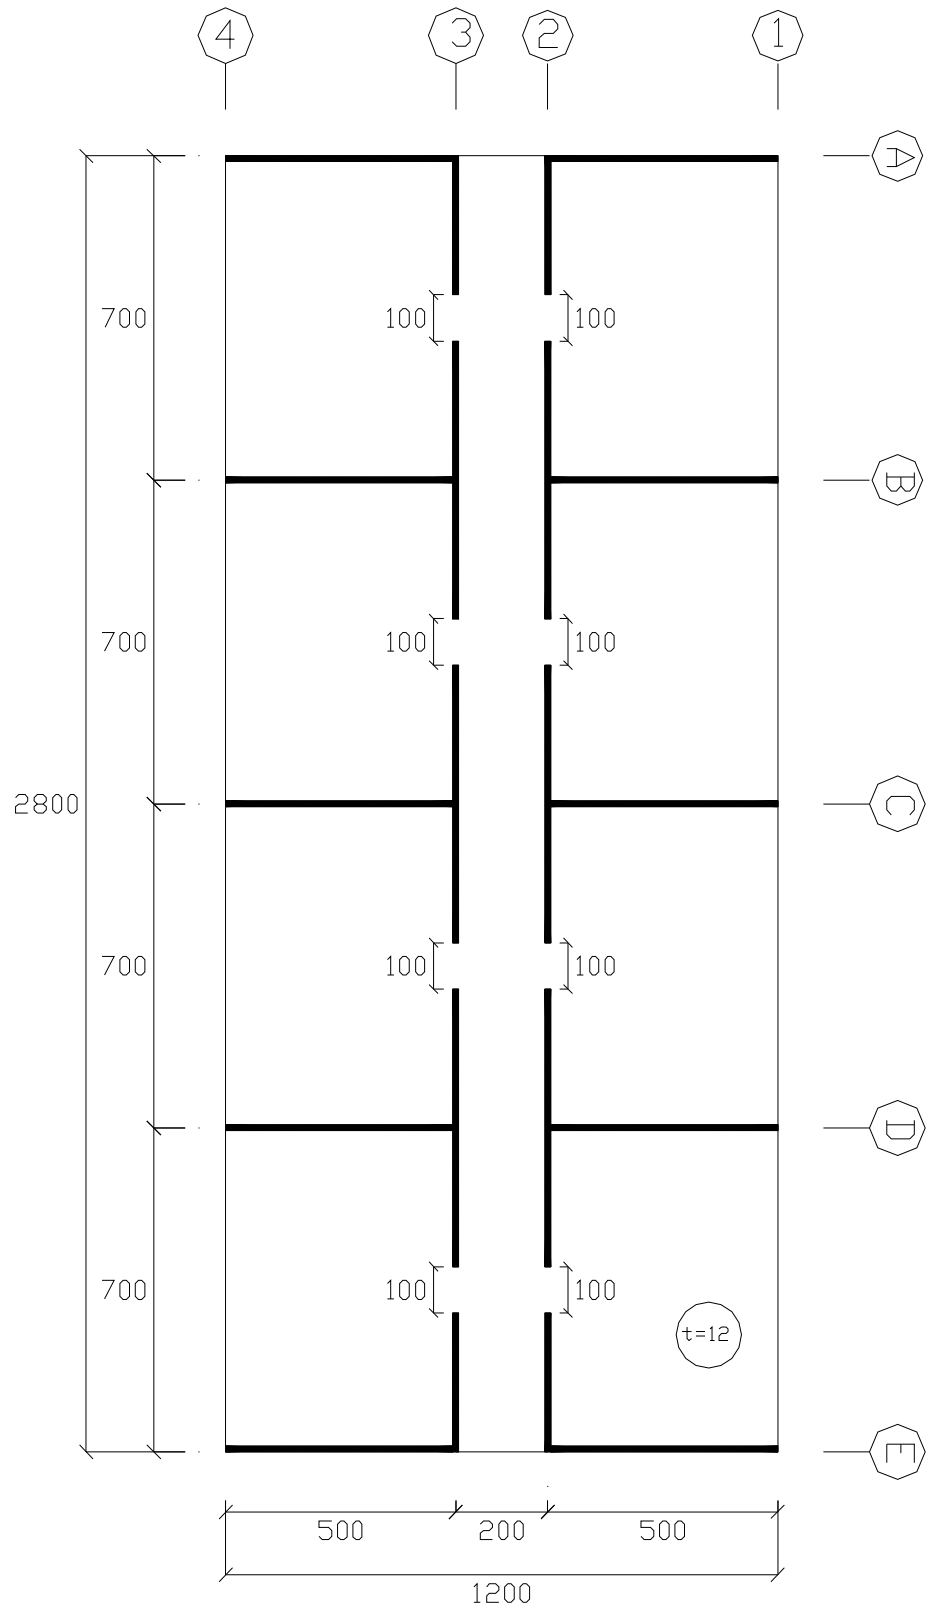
Typical plan view – Plan No. 19 (units in cm)
